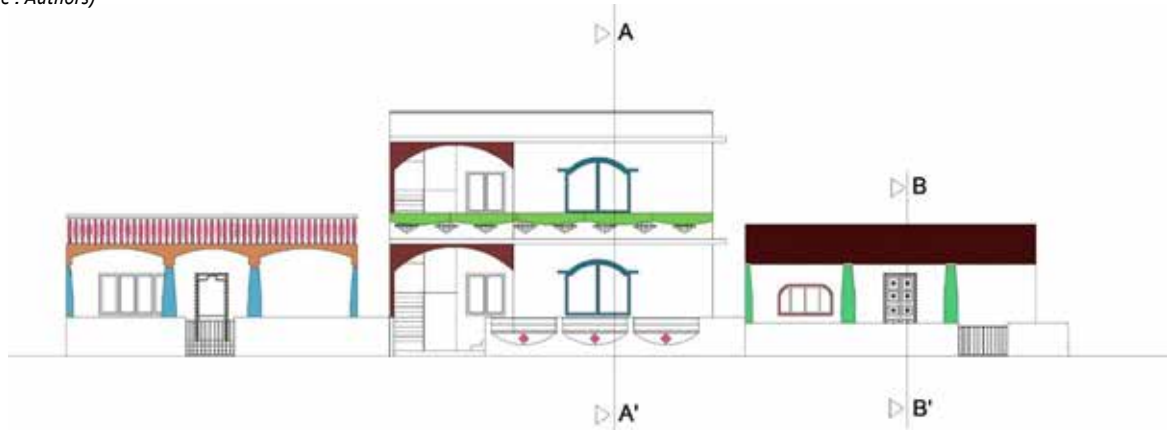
Typical elevation- Malleswaram streetscape in 1980s
